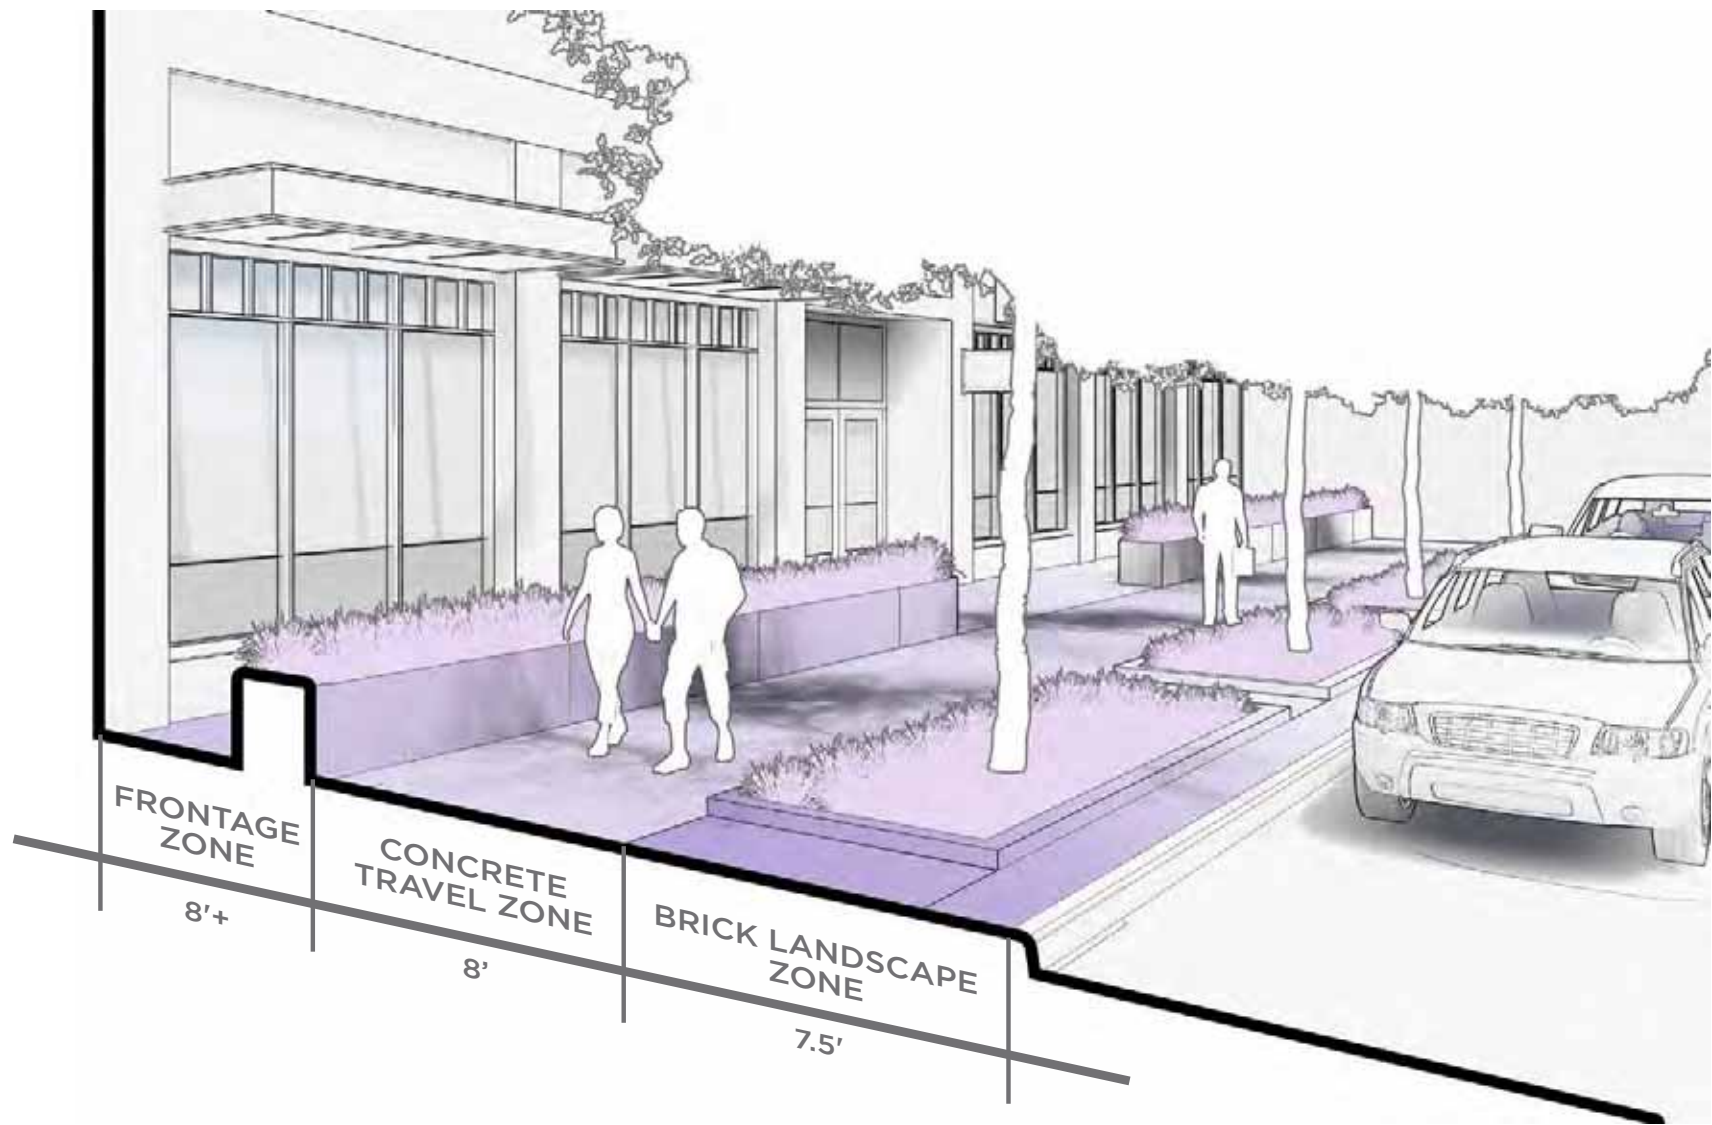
Proposed East Gateway Streetscape Typology Section
